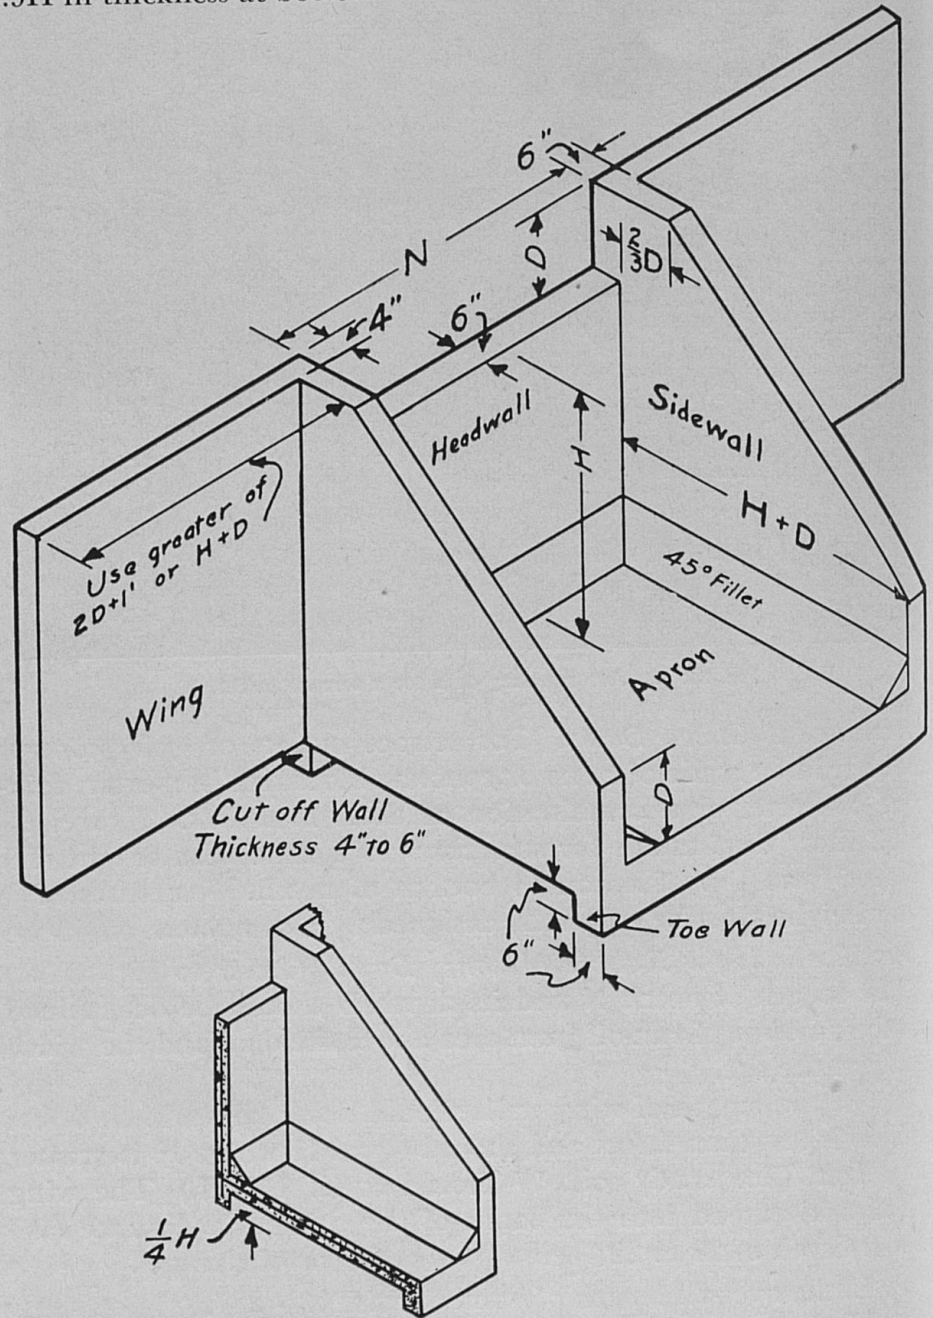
Typical small concrete dam for terrace outlet or gully control. (Plan L. 262 SCS.)
